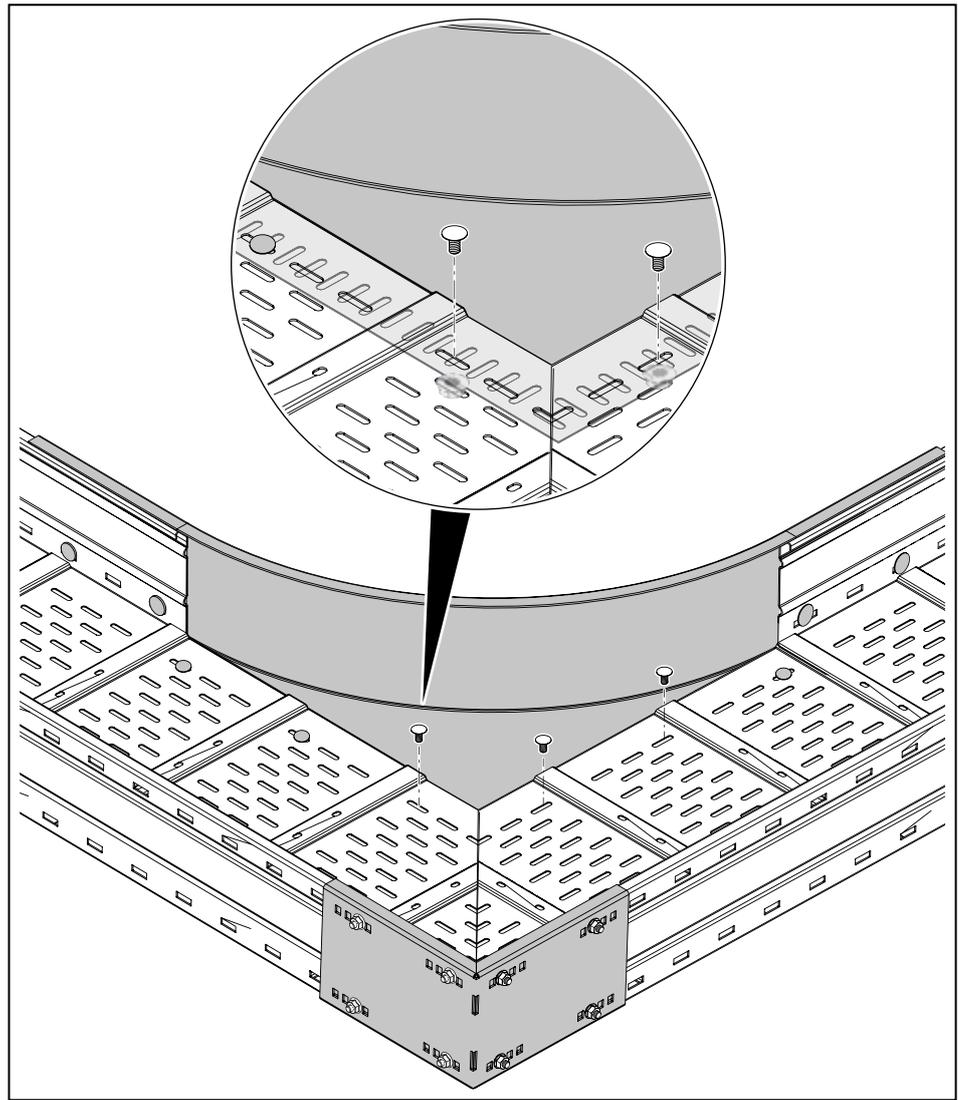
Cutting the wide span cable tray for a corner extension piece
